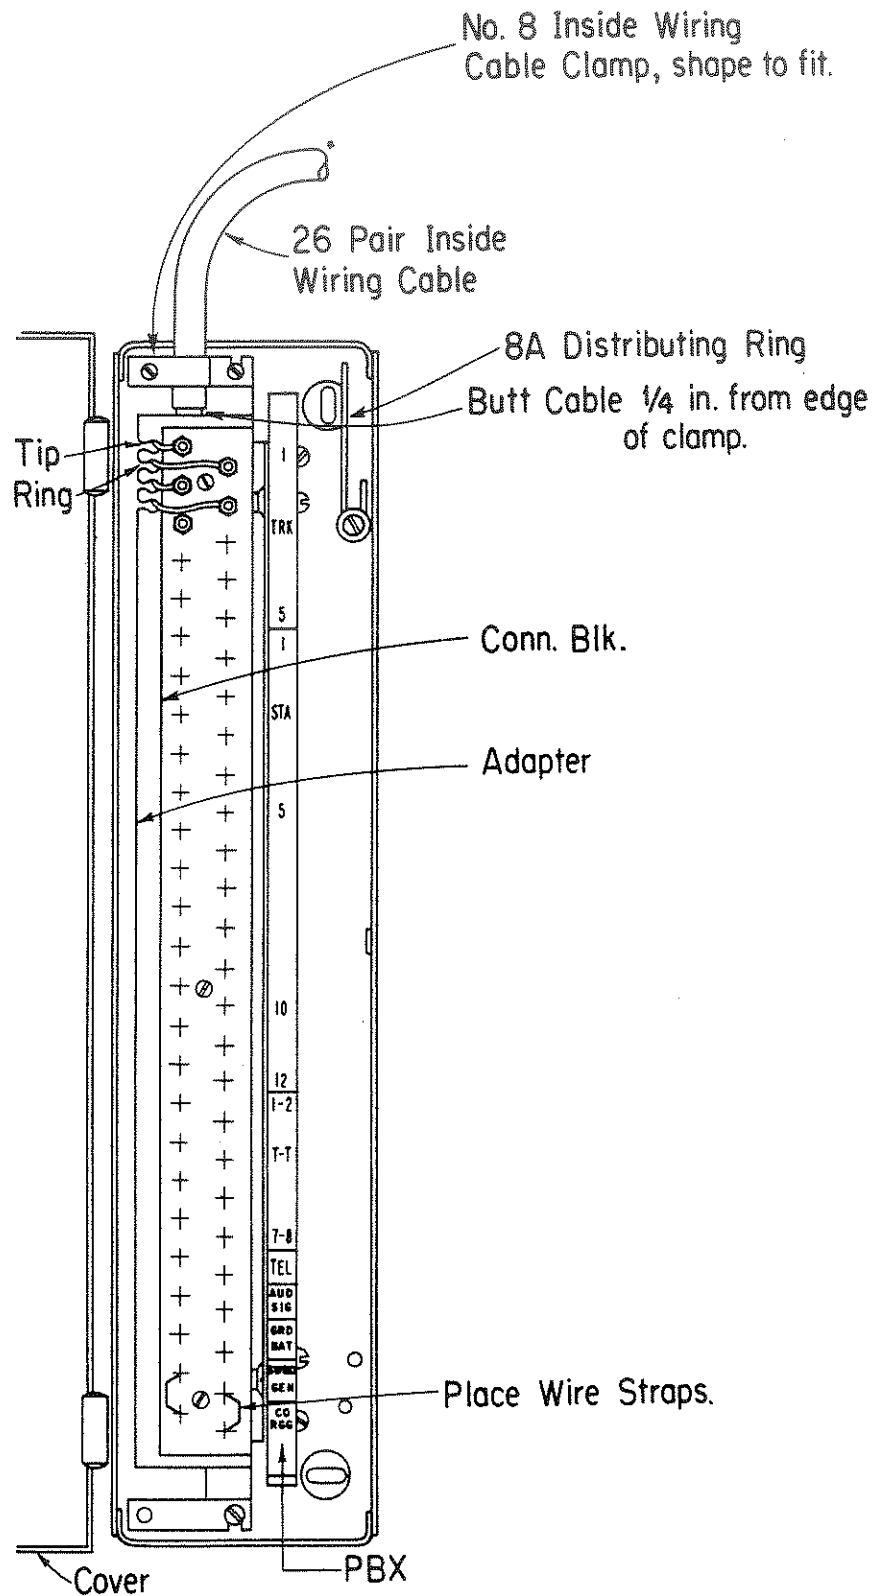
Typical Arrangement for 507B PBX with Prefabricated Sheet Metal Chassis Using 26-Pair Cable (Manufacture Discontinued)
